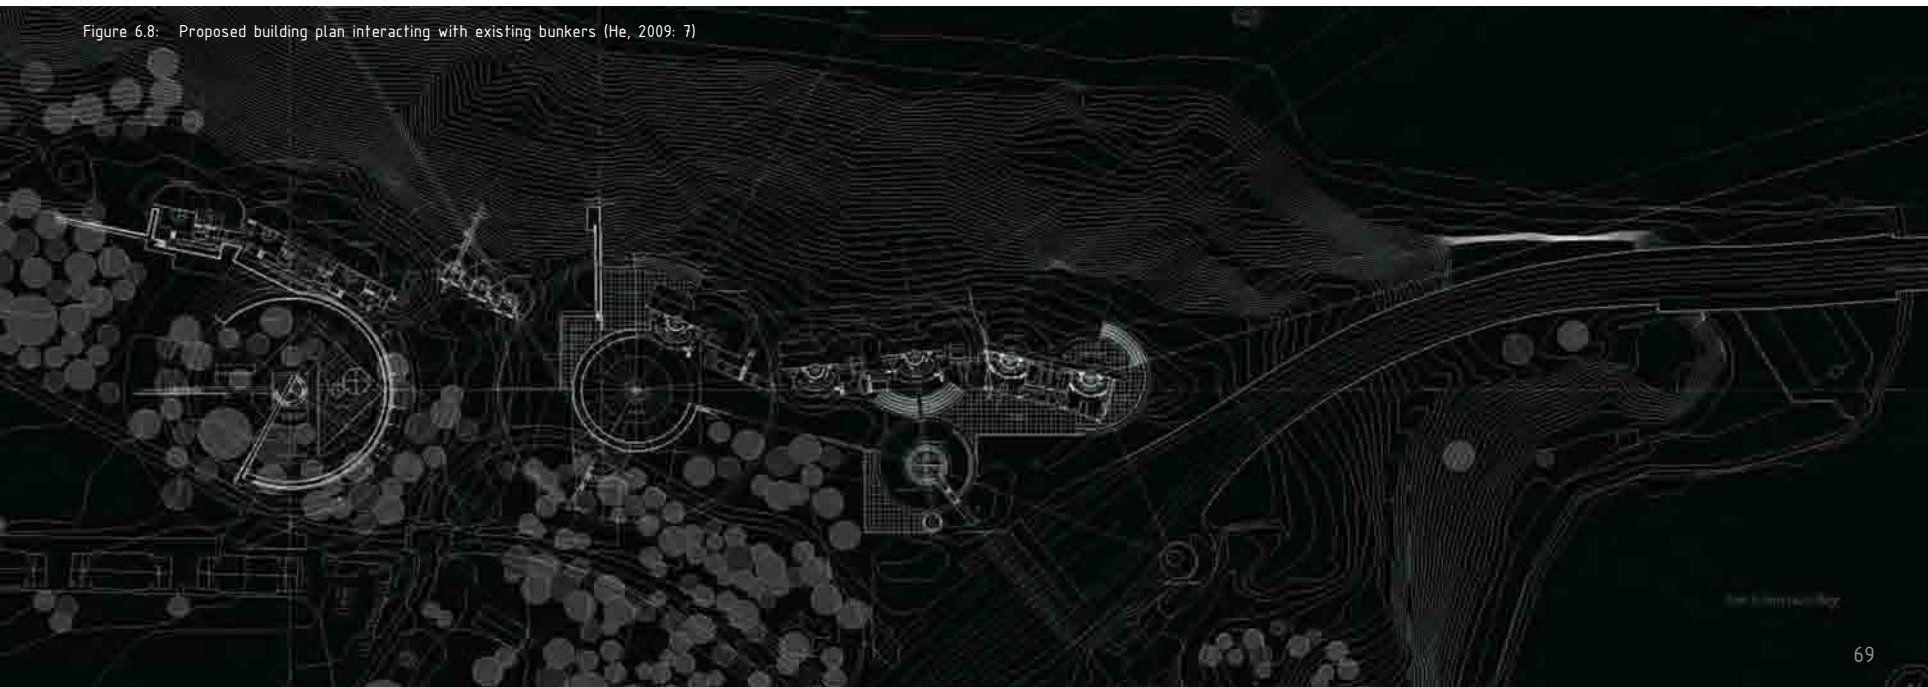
Proposed building plan interacting with existing bunkers (He, 2009: 7)
